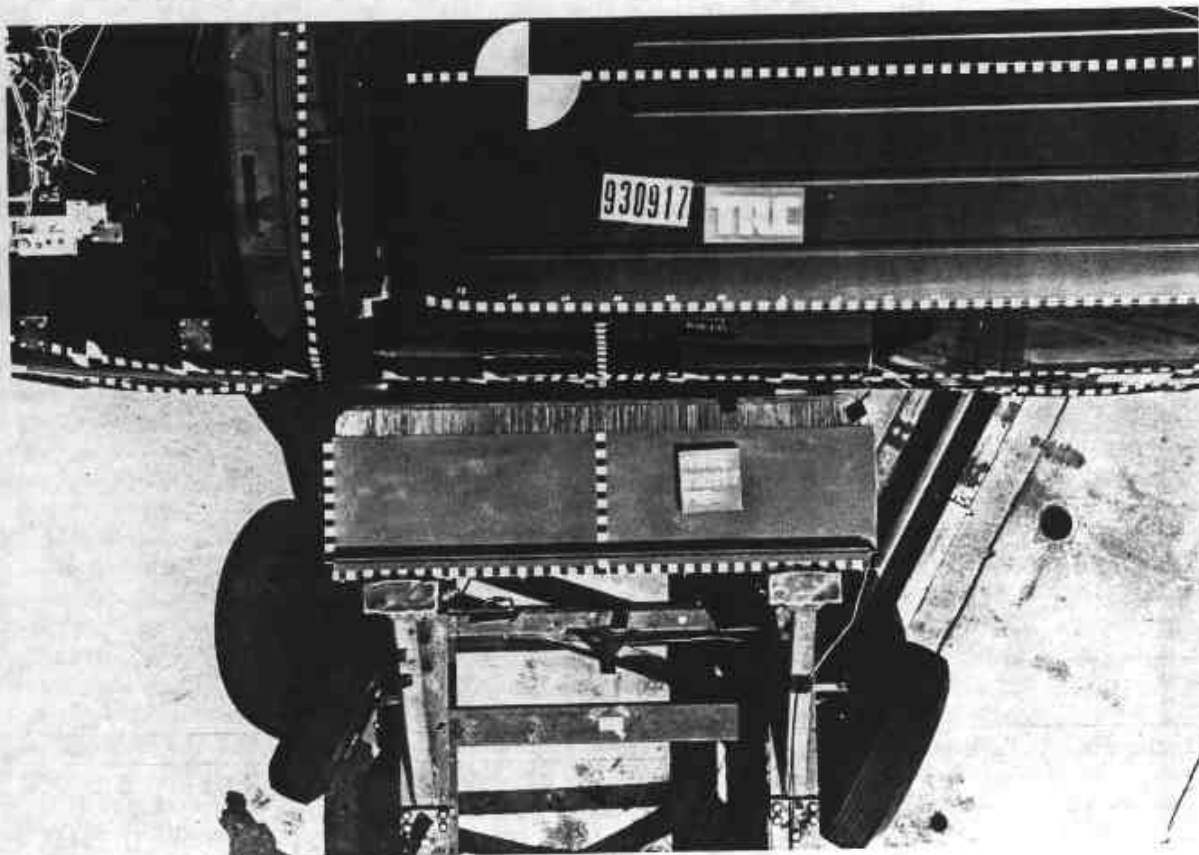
PRE-TEST OVERHEAD CLOSE-UP VIEW
